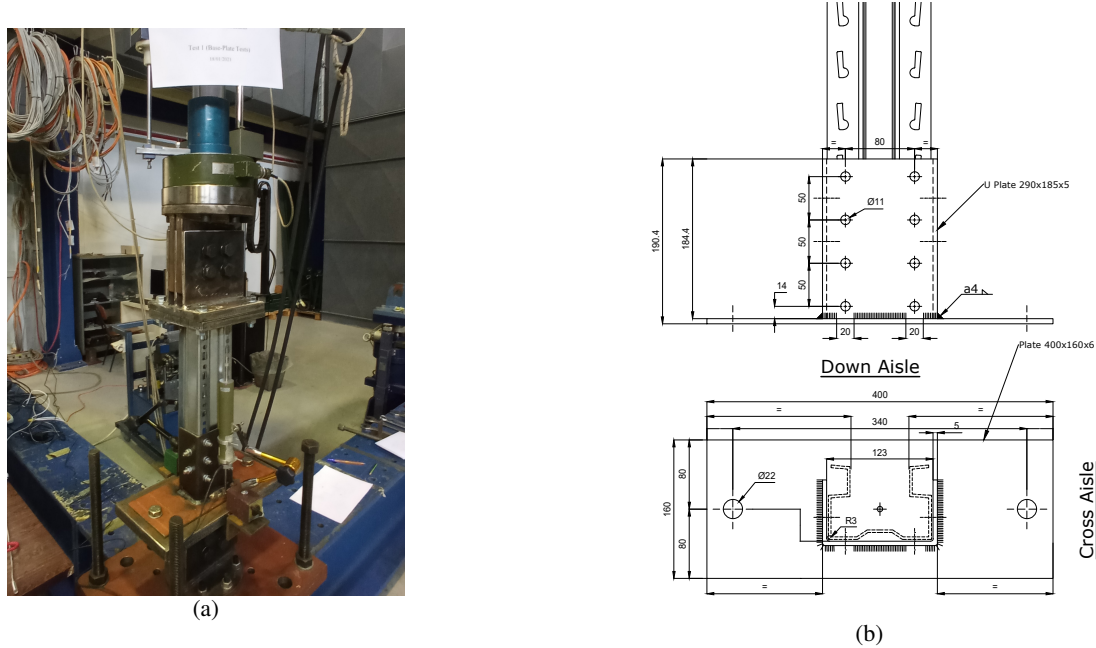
Perspective photographic view of the specimen mounted into the testing machinery (a). Lateral and top views of the base-plate connection (b) (all dimensions in mm).
